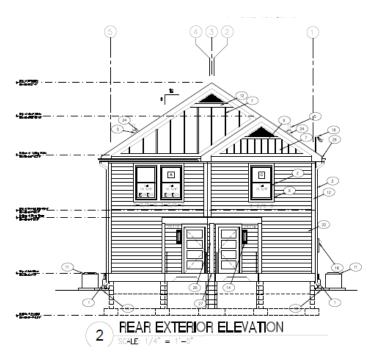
Rear elevation of the proposed duplex that faces west.
